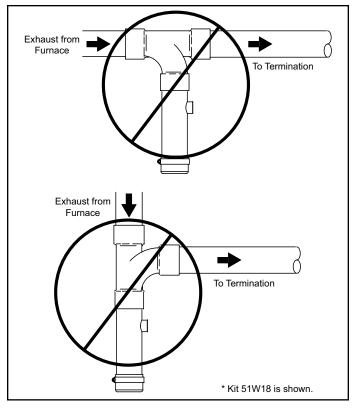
Crawl Space Vent Pipe Drain Trap Assembled Incorrectly
